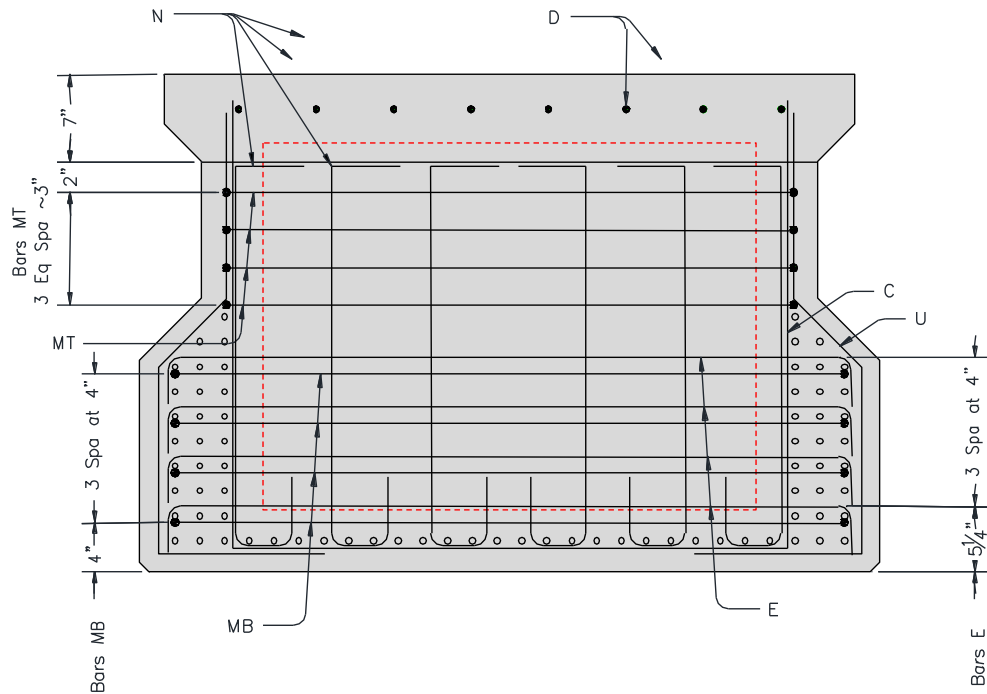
End region reinforcement used in 5B40-4. First steel curtain detail is shown.
